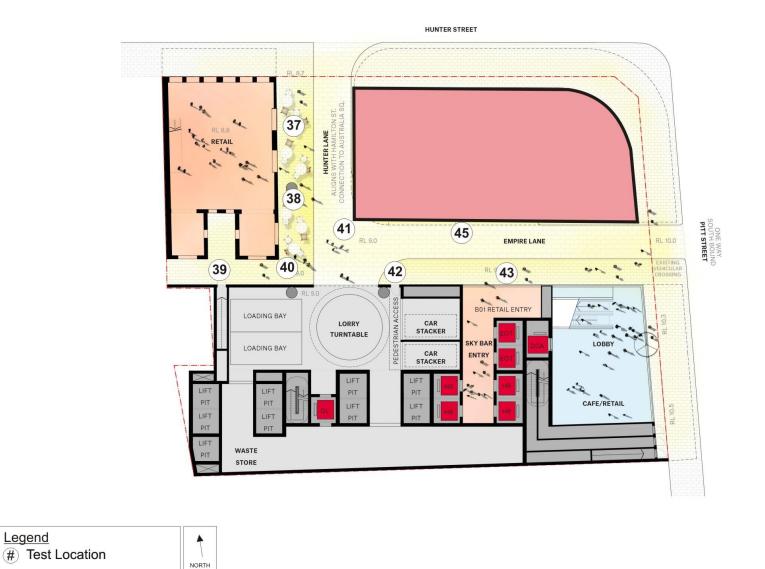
Ground level Test Locations around the internal Laneway of 15-23 Hunter Street and 105-107 Pitt Street Development, Sydney.
